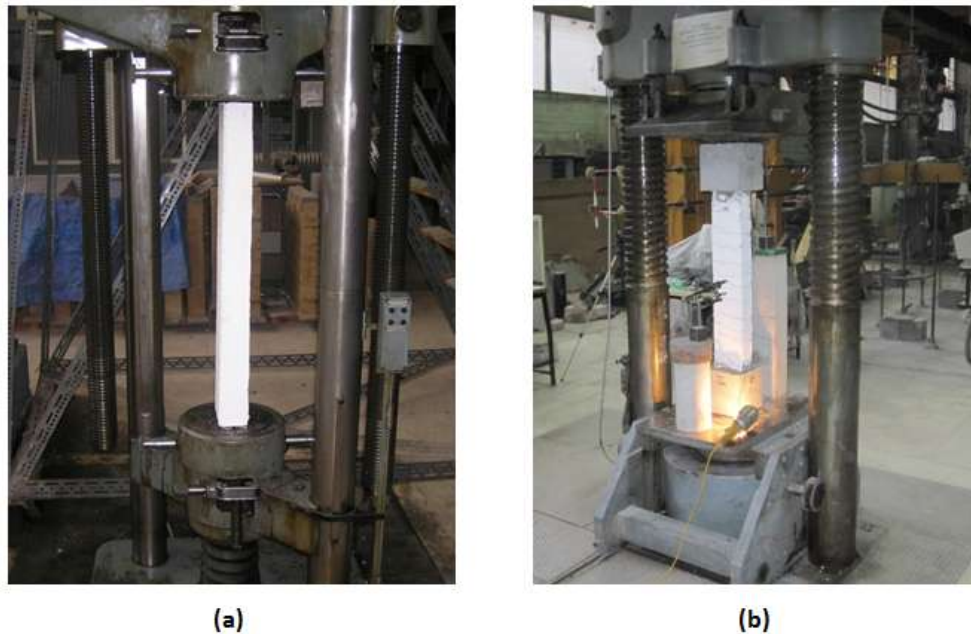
Test setup for application of: (a) Tensile loading, (b) Compressive loading.
